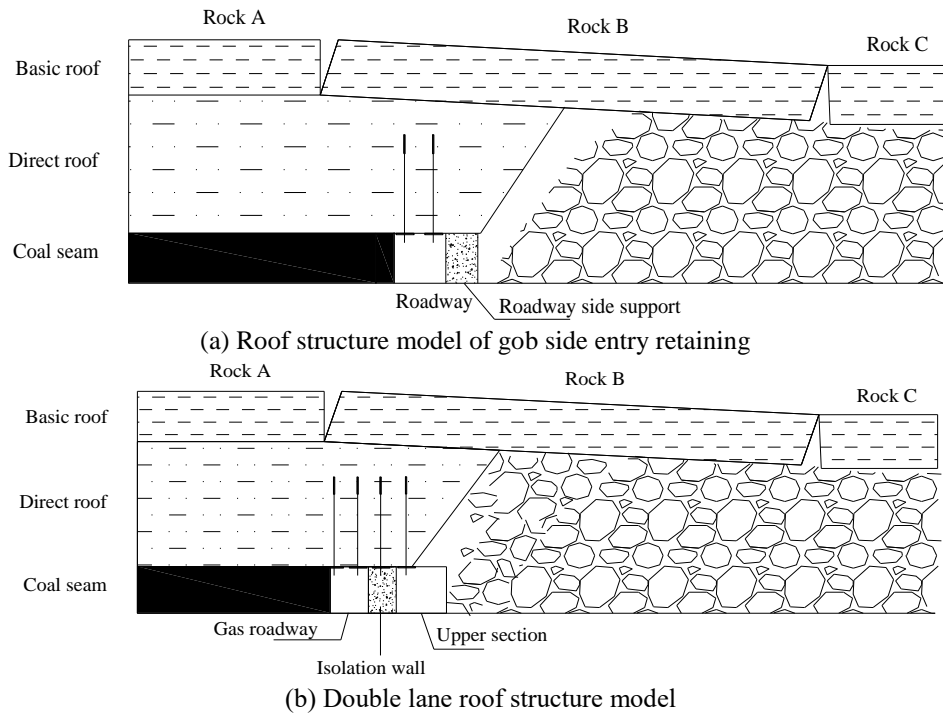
Roof structure comparison between gob-side entry retaining and double laneways
